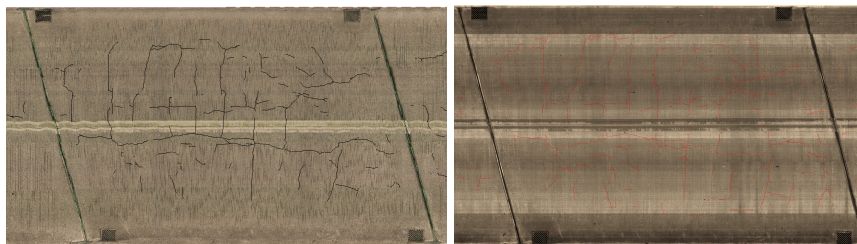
Existing Cracks of Bridge Deck No. 22387- Span 3
